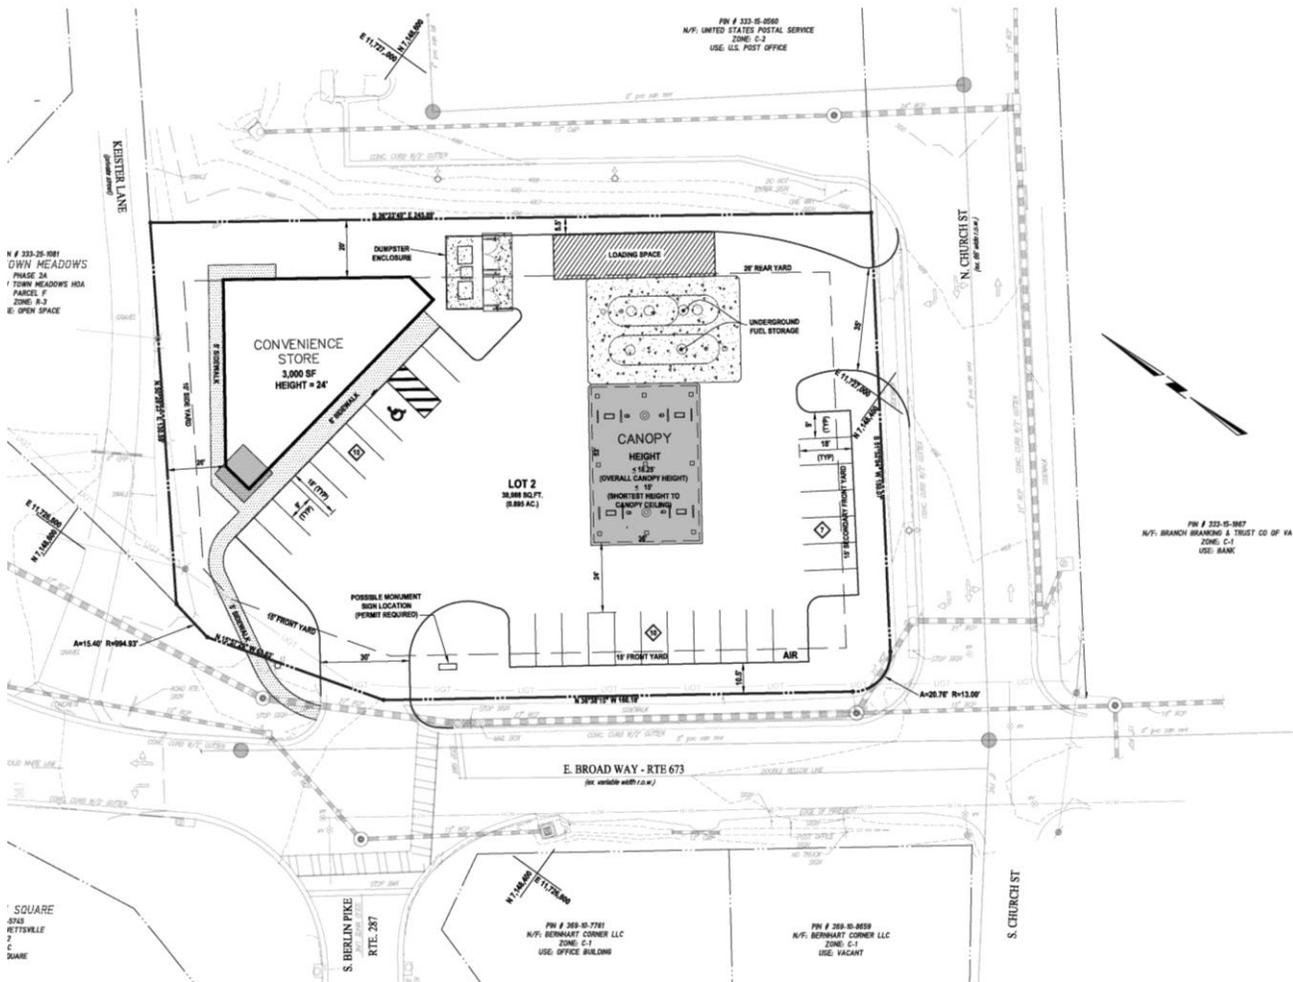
Project Concept Plan (Paciulli, Simmons & Associates)
